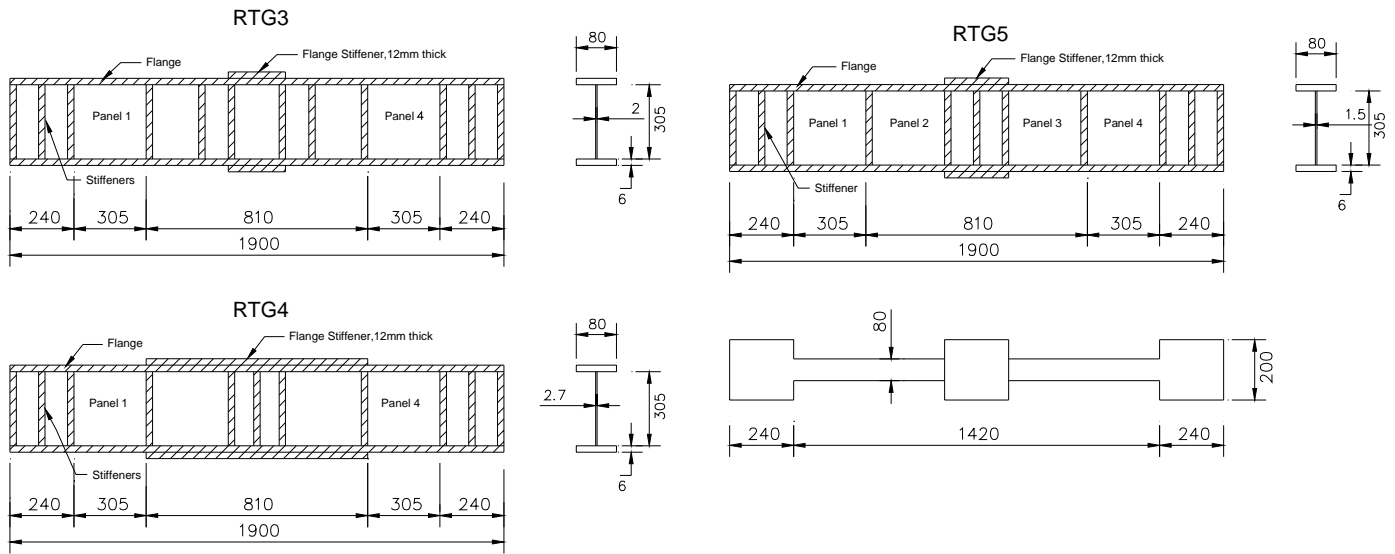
Details of Steel Plate Girder Specimen (all dimensions are in mm)
